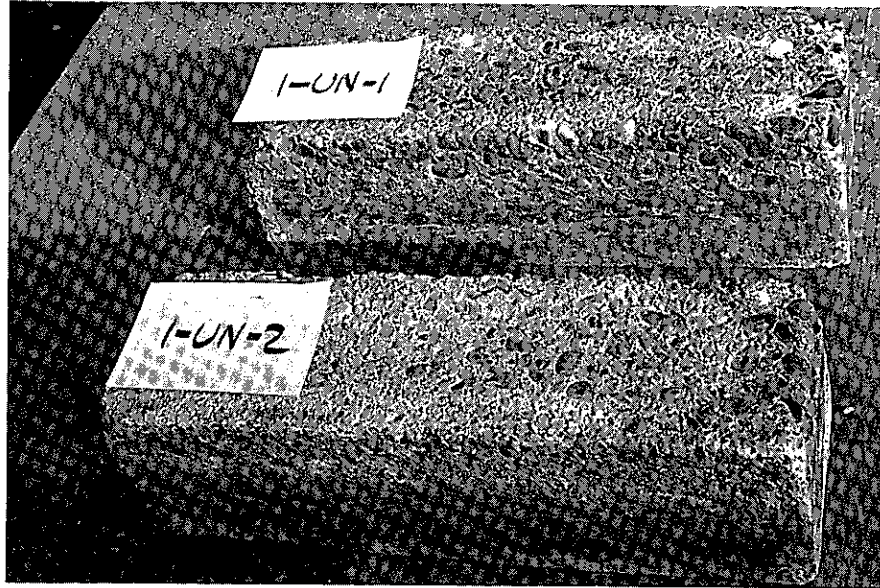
Unrestrained concrete beams made with shrinkage compensated cement no. 1 after 1 yr. sulfate exposure.
